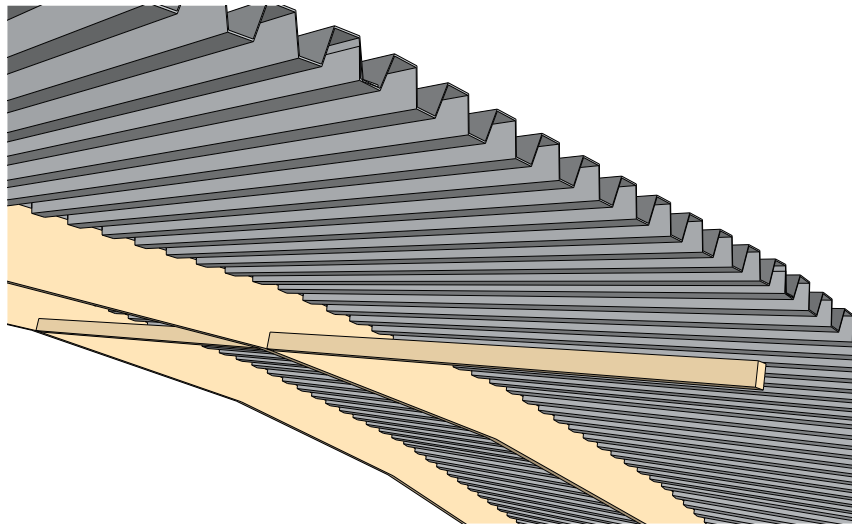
Bracing of arch structure by load bearing profiled sheets.
